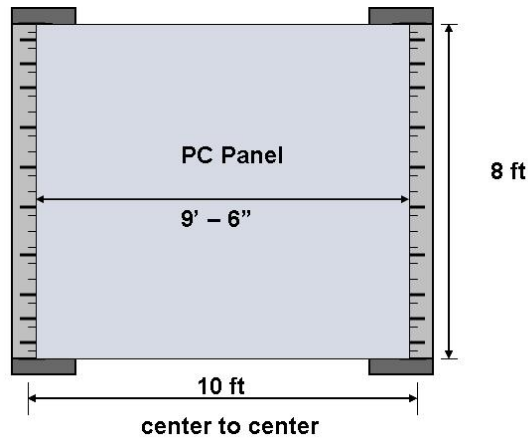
Construction of Positive Moment Specimens (Plan View)
